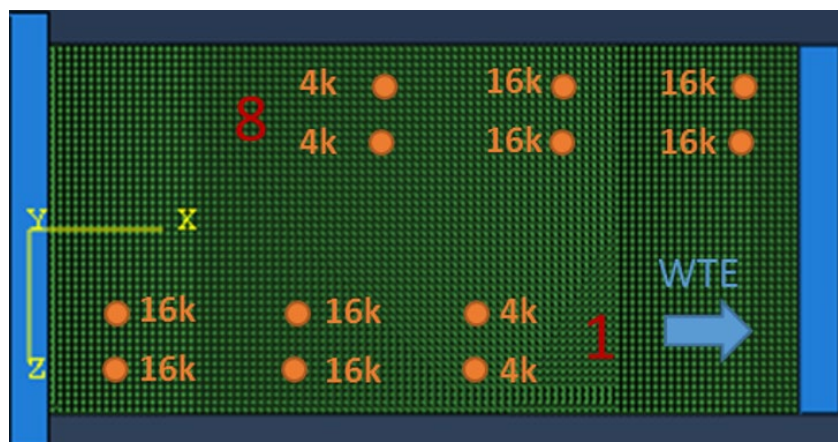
Live load applied at Box Girder 1 (Location 1 and 8)
